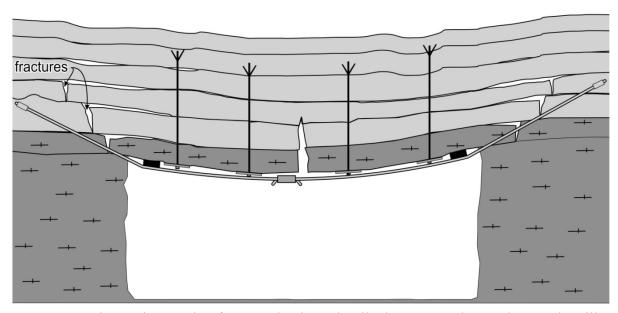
Stairstepping tension fractures begin at the rib abutment and extends over the pillar.
